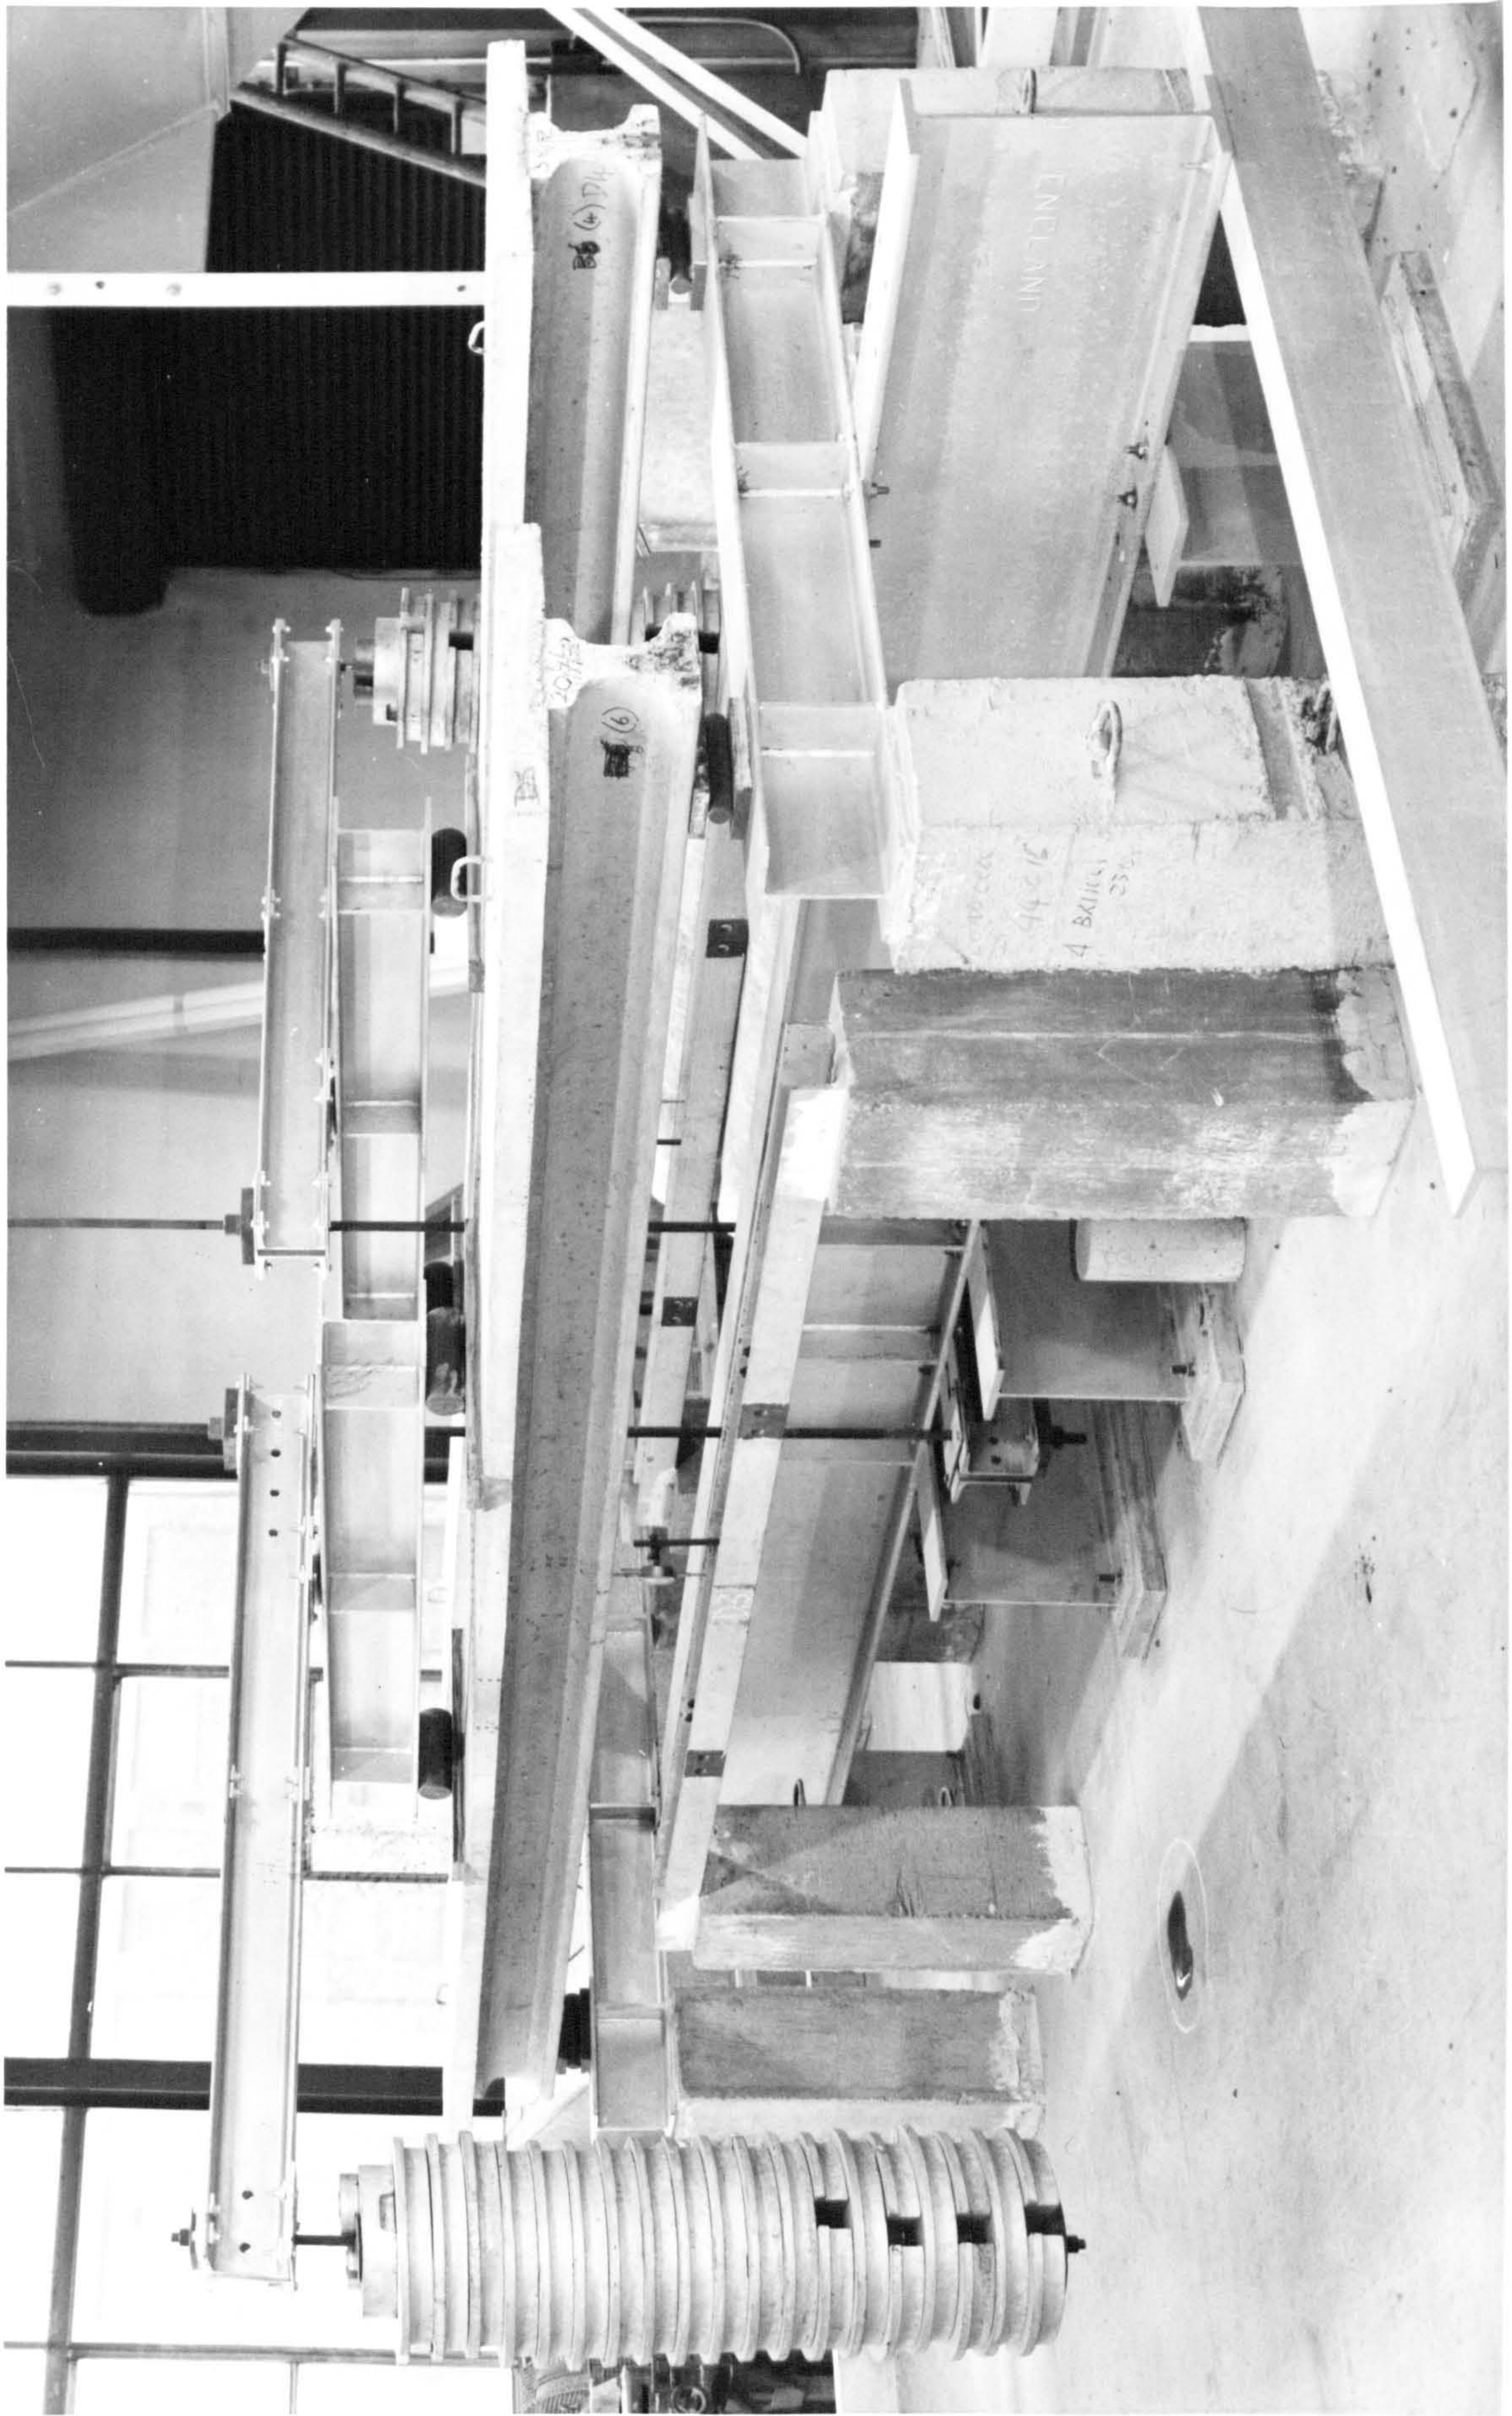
LOADING ARRANGEMENT FOR LONG TERM TESTS
